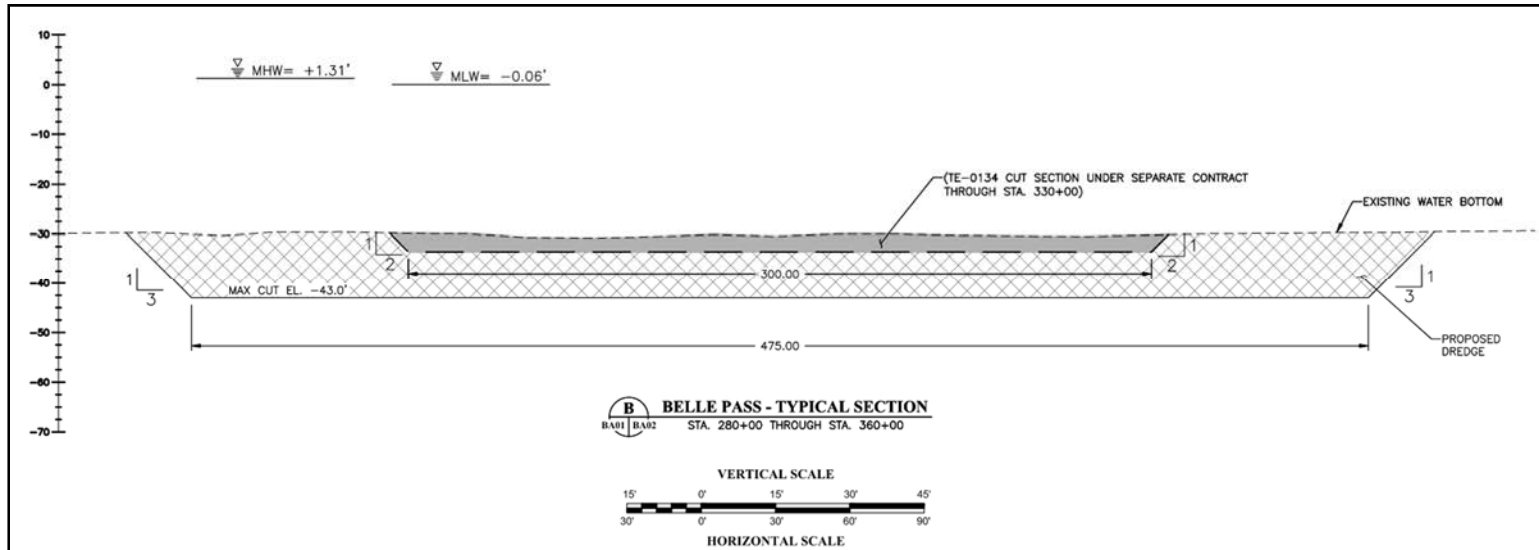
BA Typical Dredging Cross Section Sta. 280+00 to Sta. 360+00
